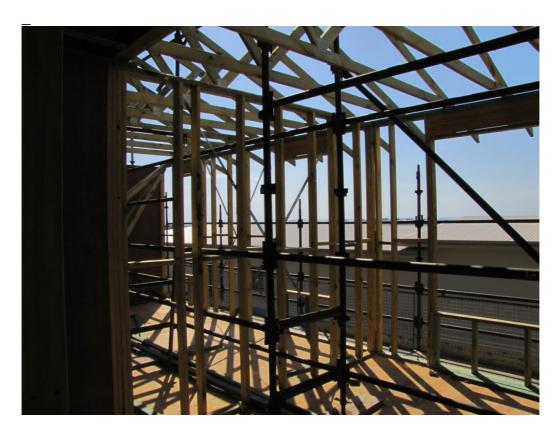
(above) is taken from the objector's home presently under construction and indicates that at this section of the house the horizon is visible over the roof of the house at the subject property (as the middle of the subject properties roof is lowered).
